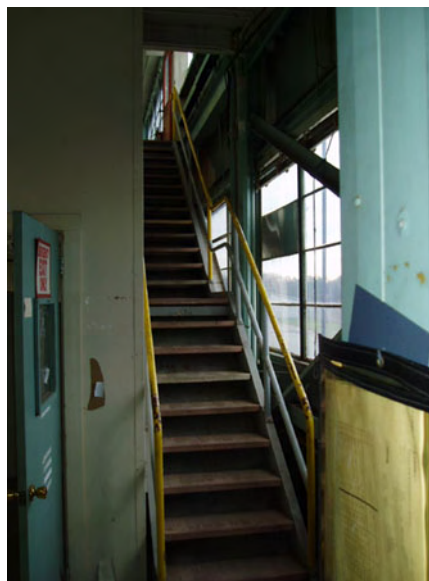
Photo G2-145, G2 337-Foot Level, Northwest Stairway, November 2004
